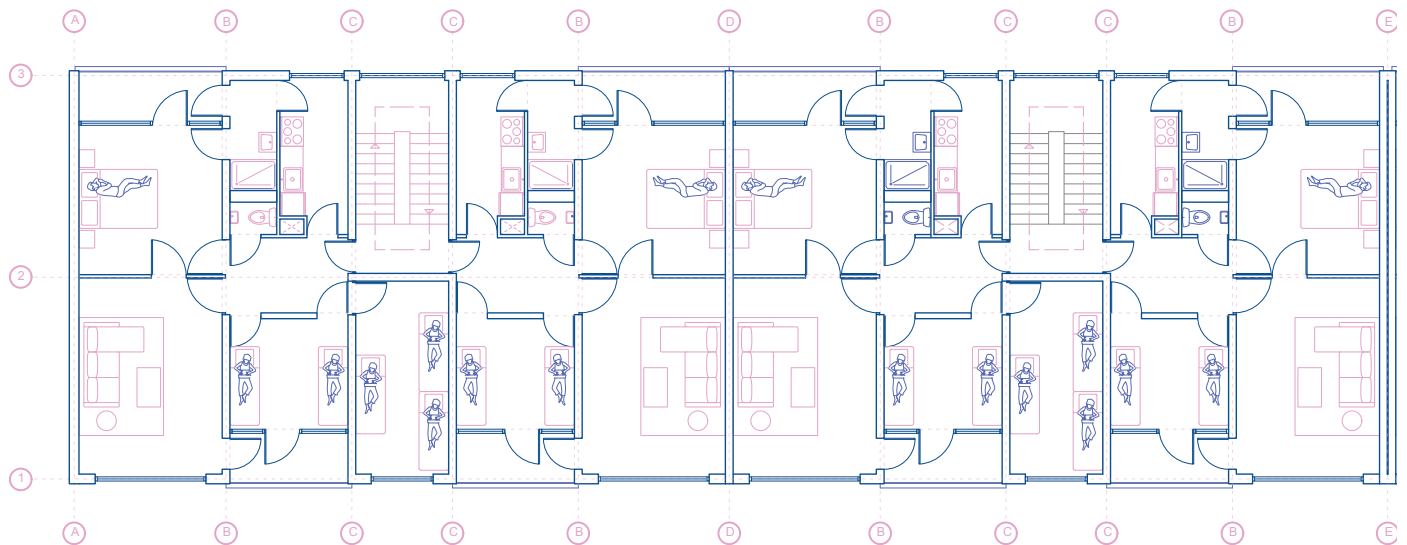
Floor plan of the existing situation with the originally intended number of persons (By Author)
